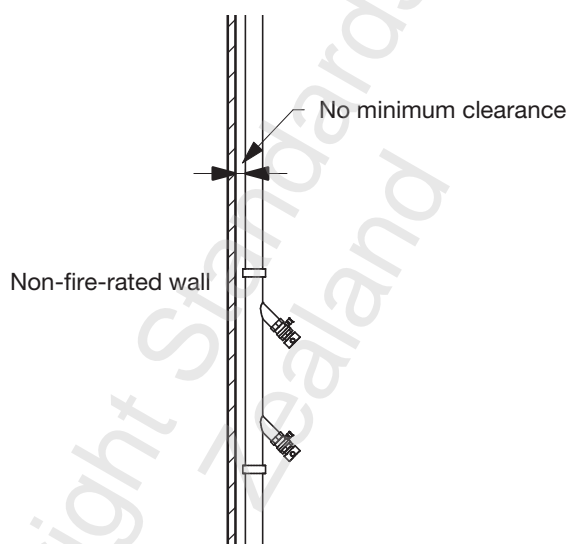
Sprinklered building – Hydrant outlet protection – No distance required – Section view
